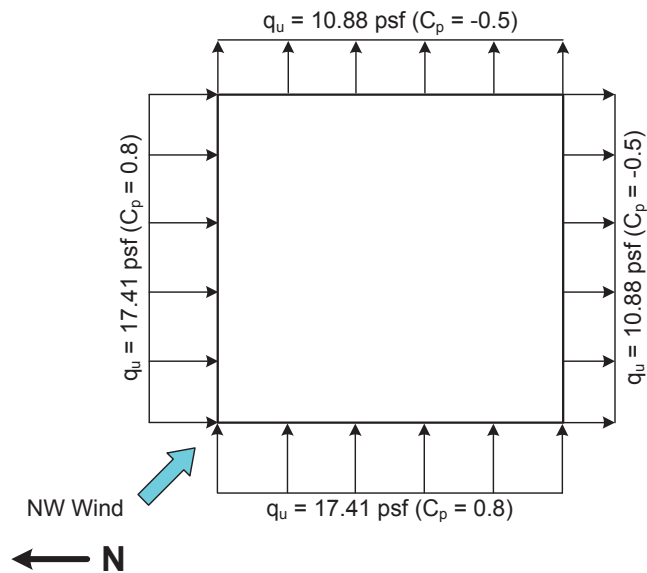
Case 5 - Wind Loads applied to walls due to northwest wind.
